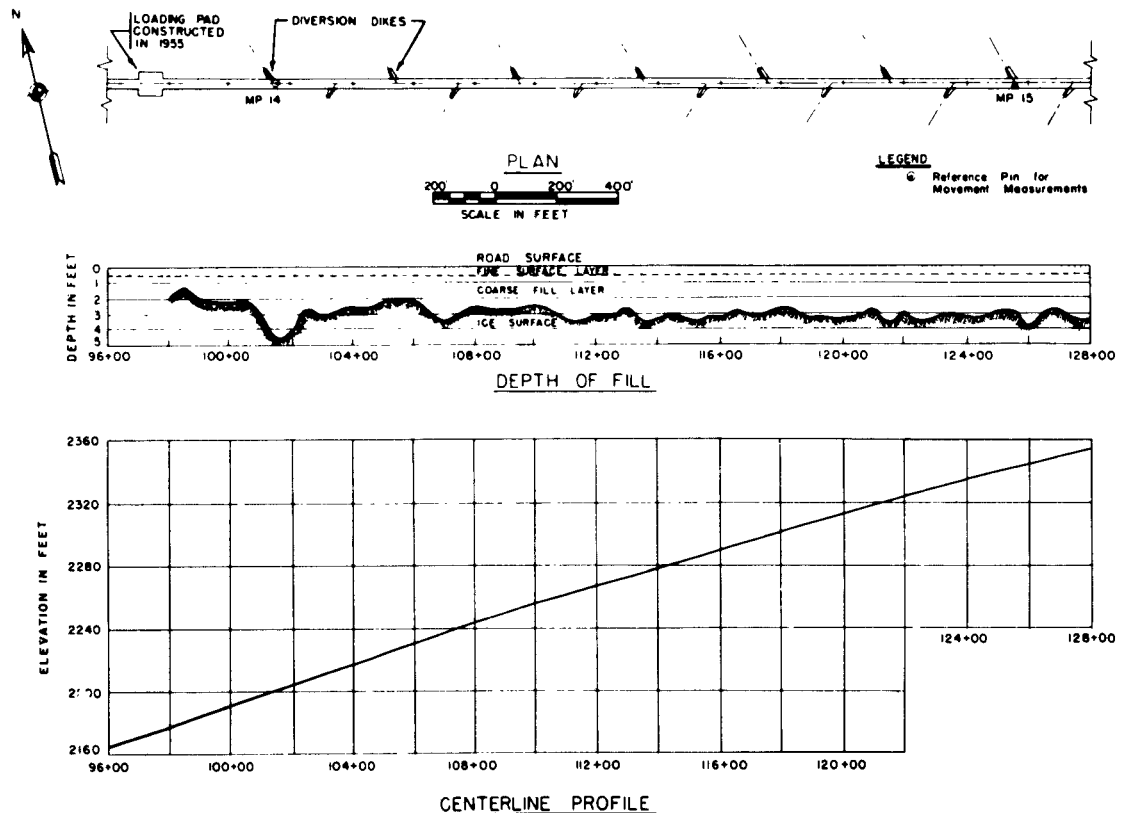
Plan and profile, Ramp Road, September 1957, Stations 97+00 to 128+00.
